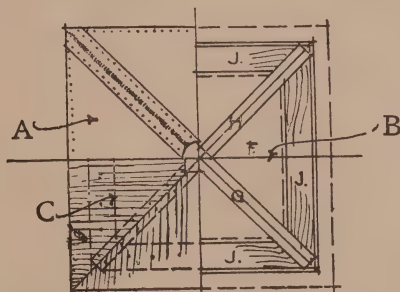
A, Finished Roof; B, Roof without Boarding; C, Roof Boarding
